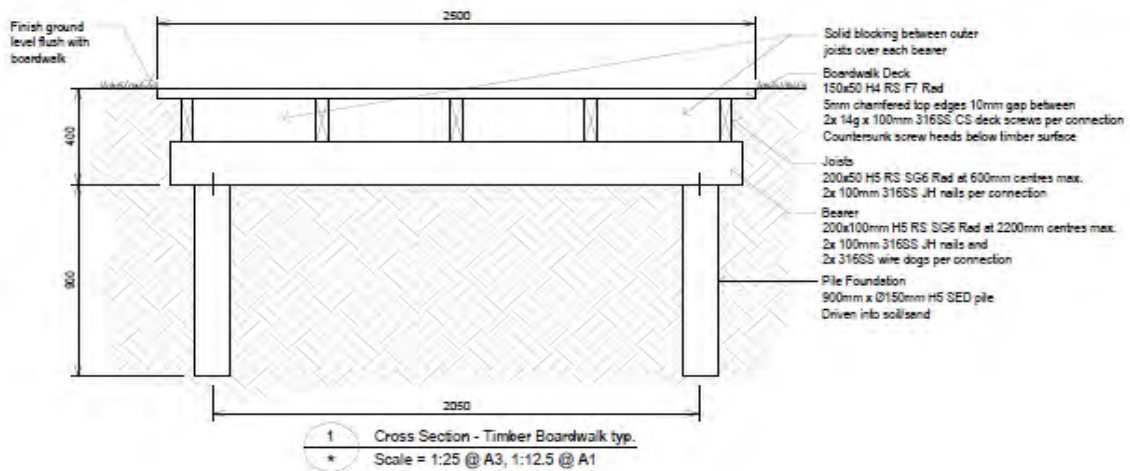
; Typical Cross-section of the Proposed Boardwalk.
